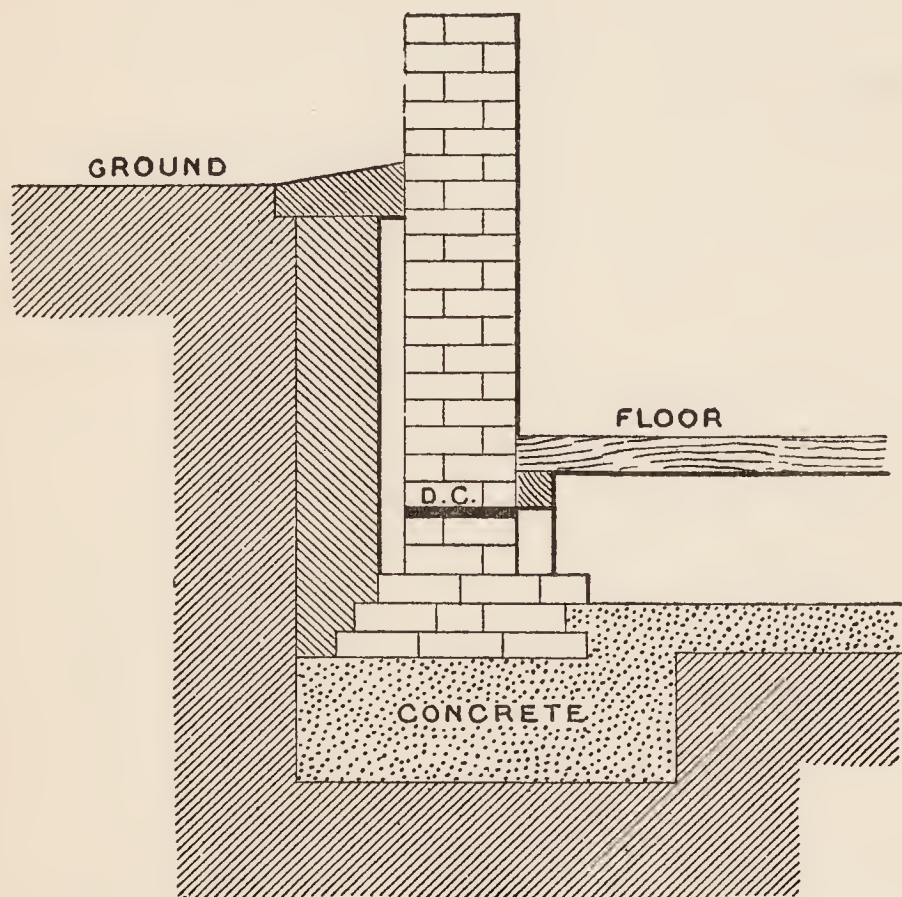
Section of Wall, showing Concrete Foundation, Damp-proof Course, Dry Area, &c.
